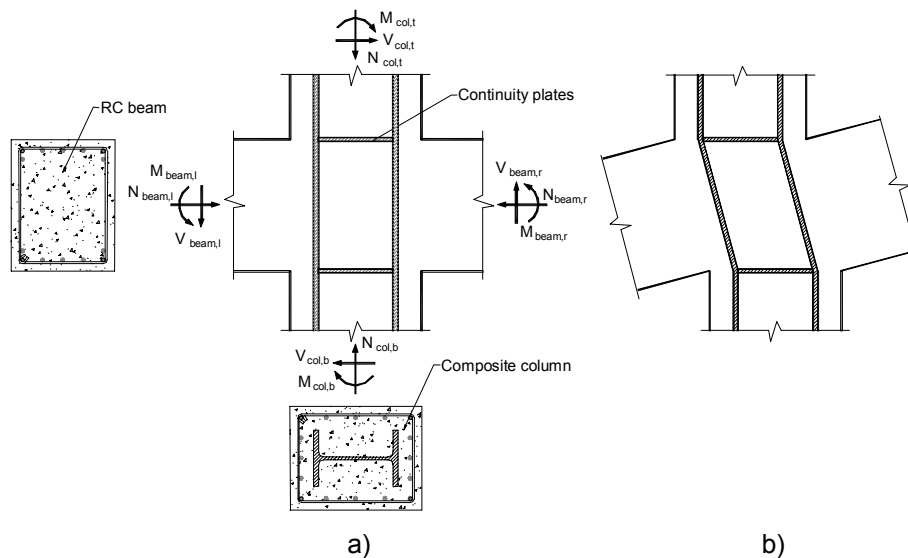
(a) Forces acting at the connection, (b) joint deformation
